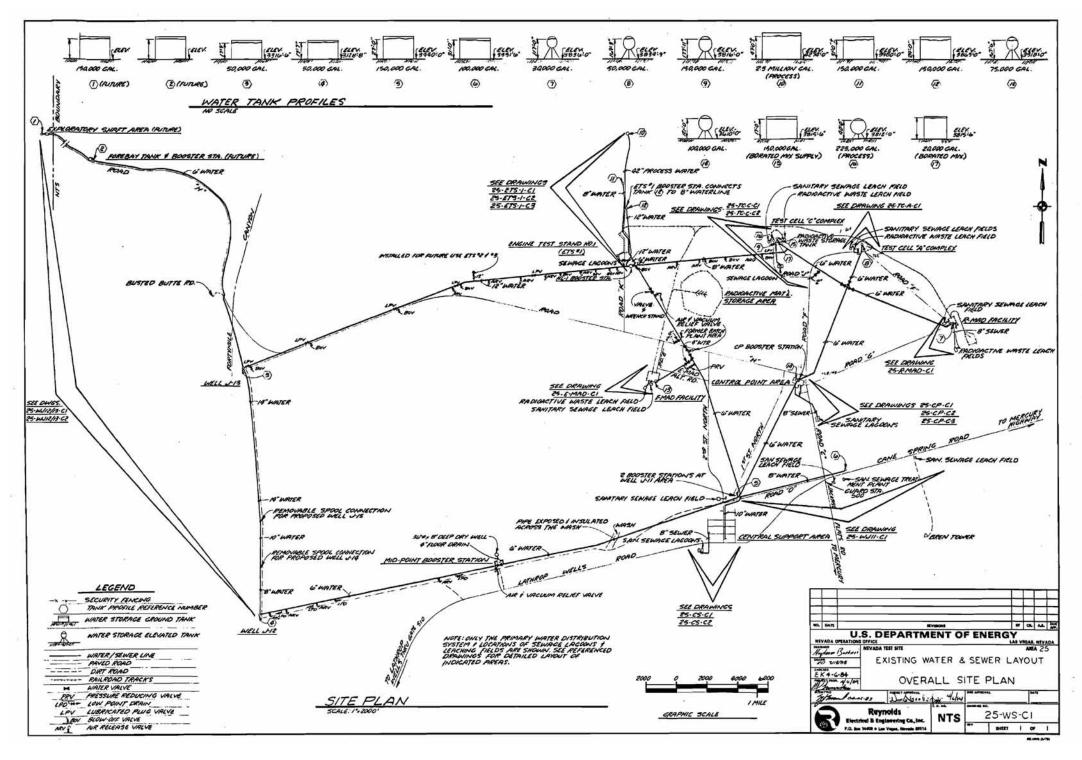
Existing Water and Sewer Layout Overall Site Plan
